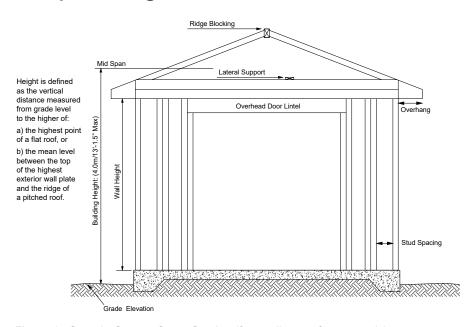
Sample Garage Cross Section (for applicant reference only)
